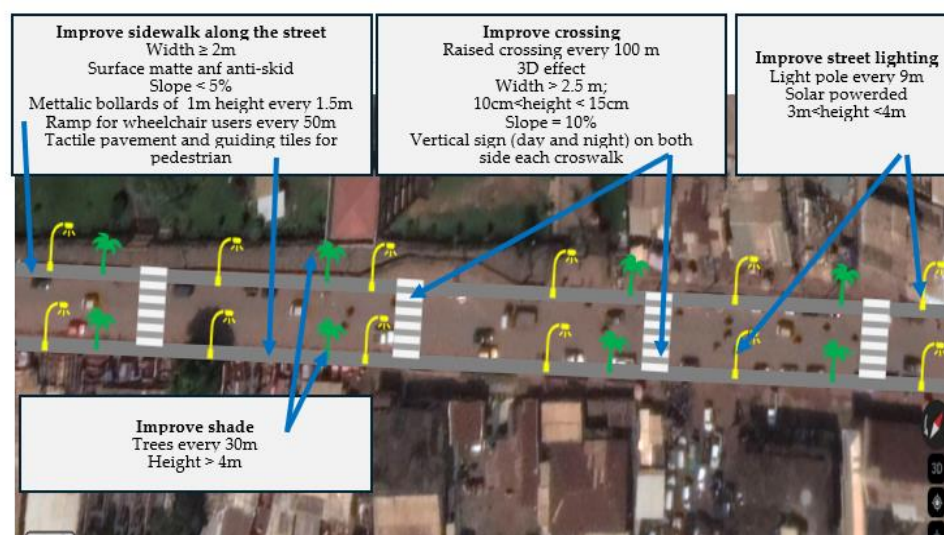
Engineering intervention at road segment R9 to improve its pedestrian safety grade from E to A.
